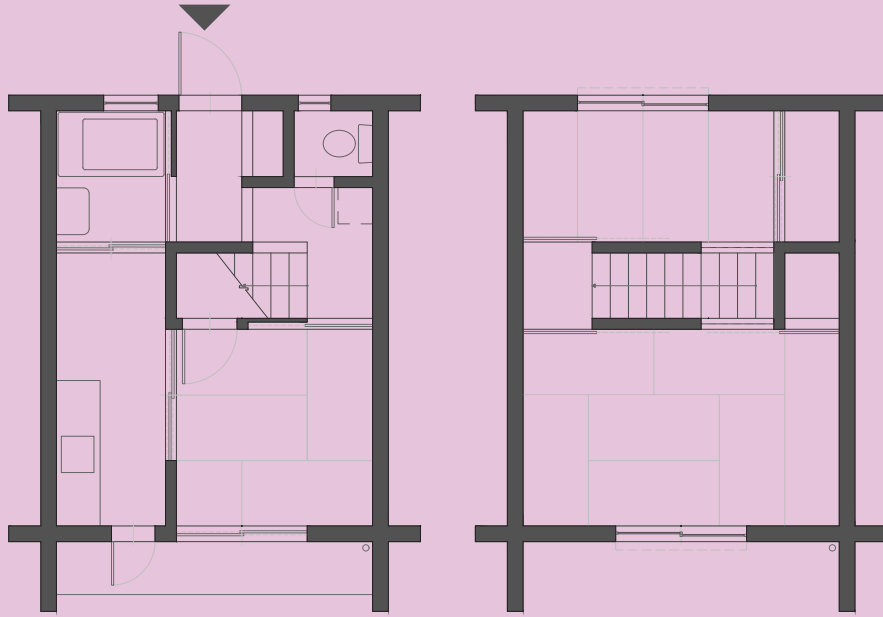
Plan of Terrace House (57-TN-3K-2-C) Typology. Source: Authors
